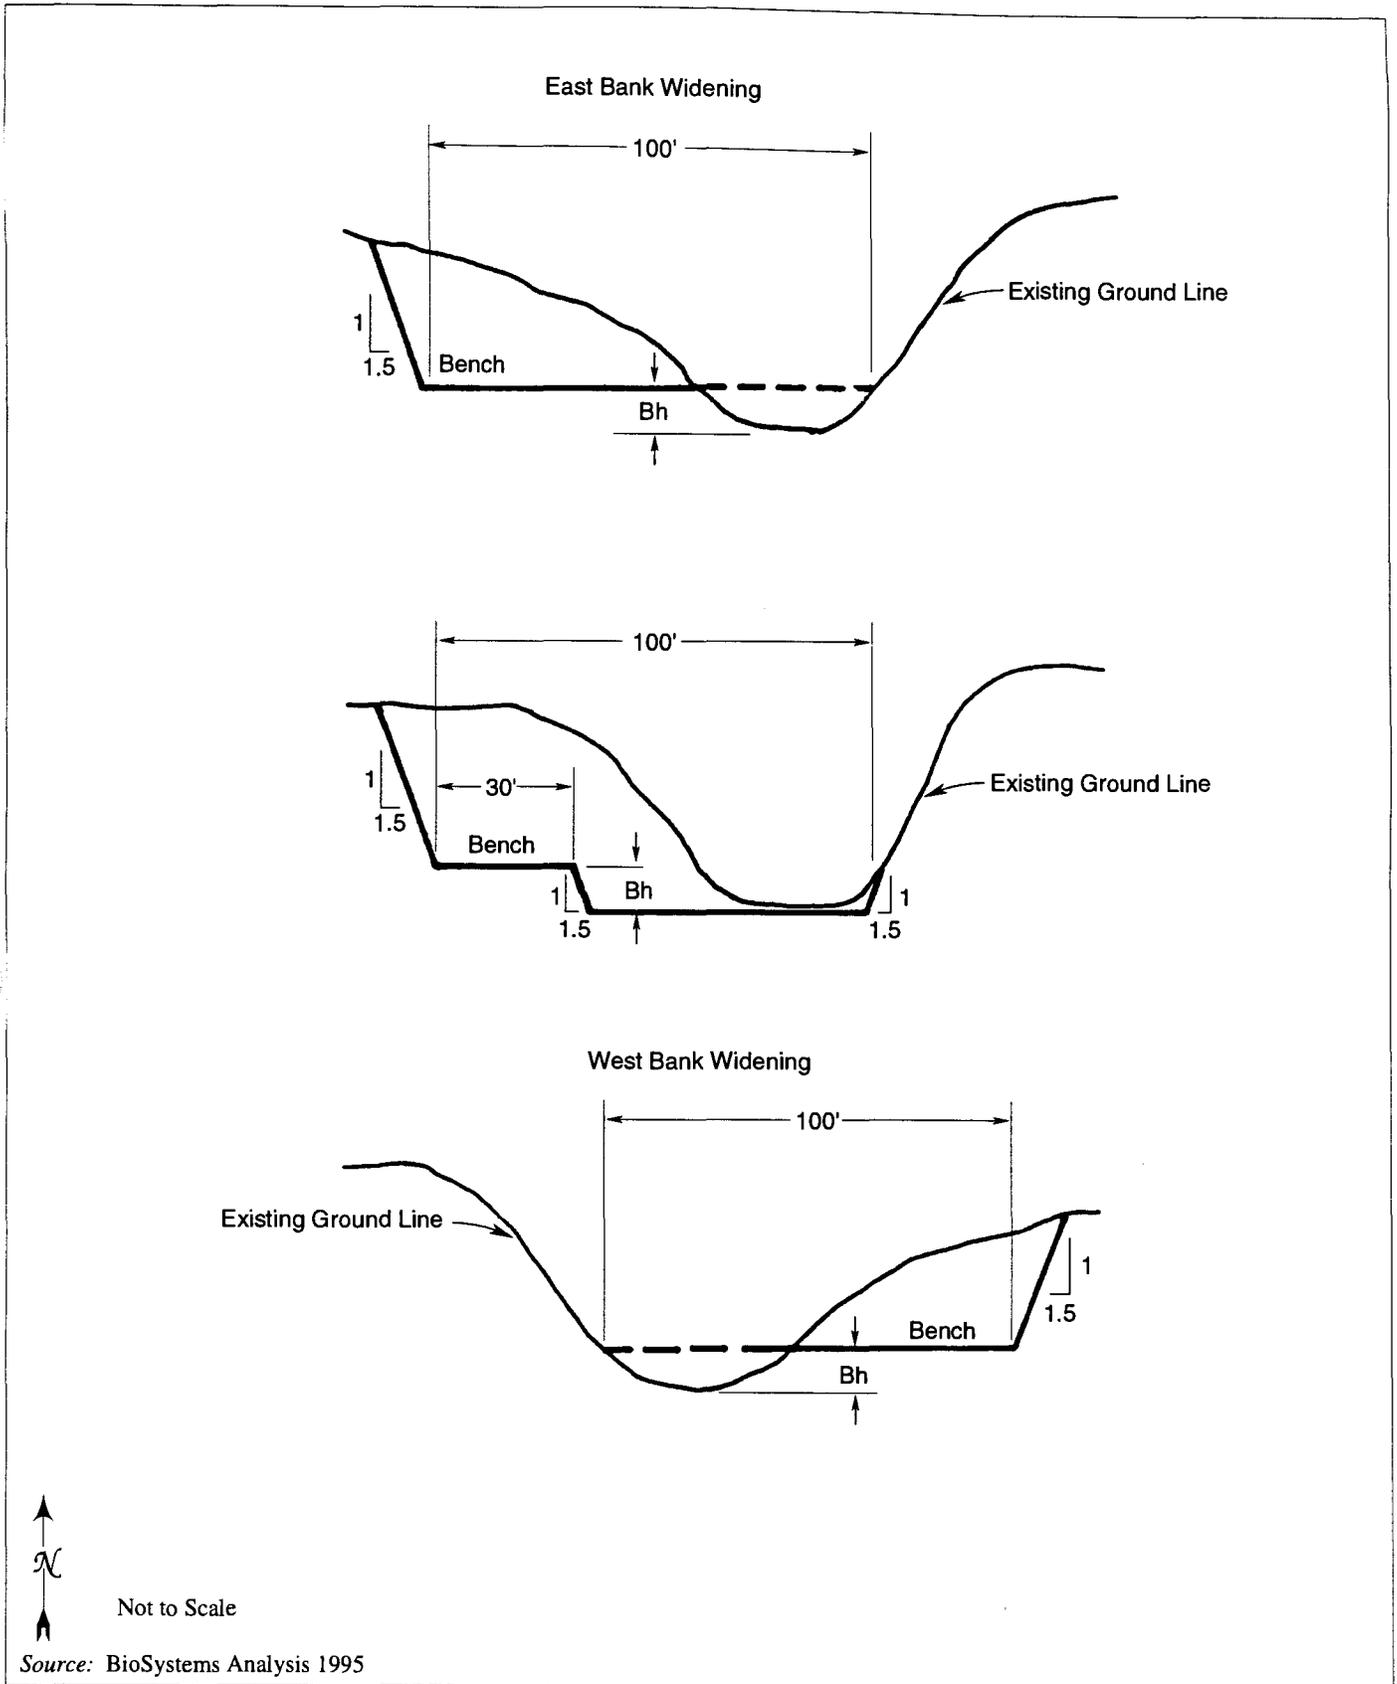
Conceptual Widened Earth Channel Plan Designs
